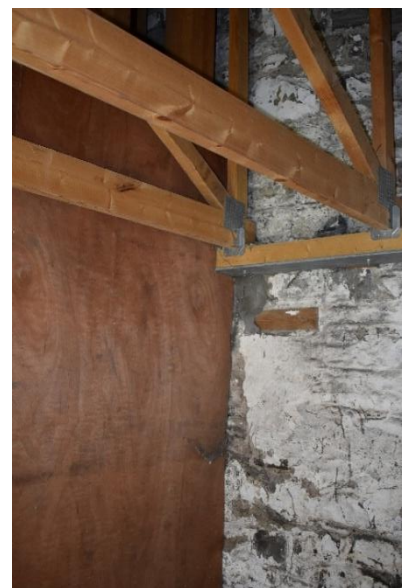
Detail of timber cross wall and low ceiling height trussed rafter roofs. Photo HHC
